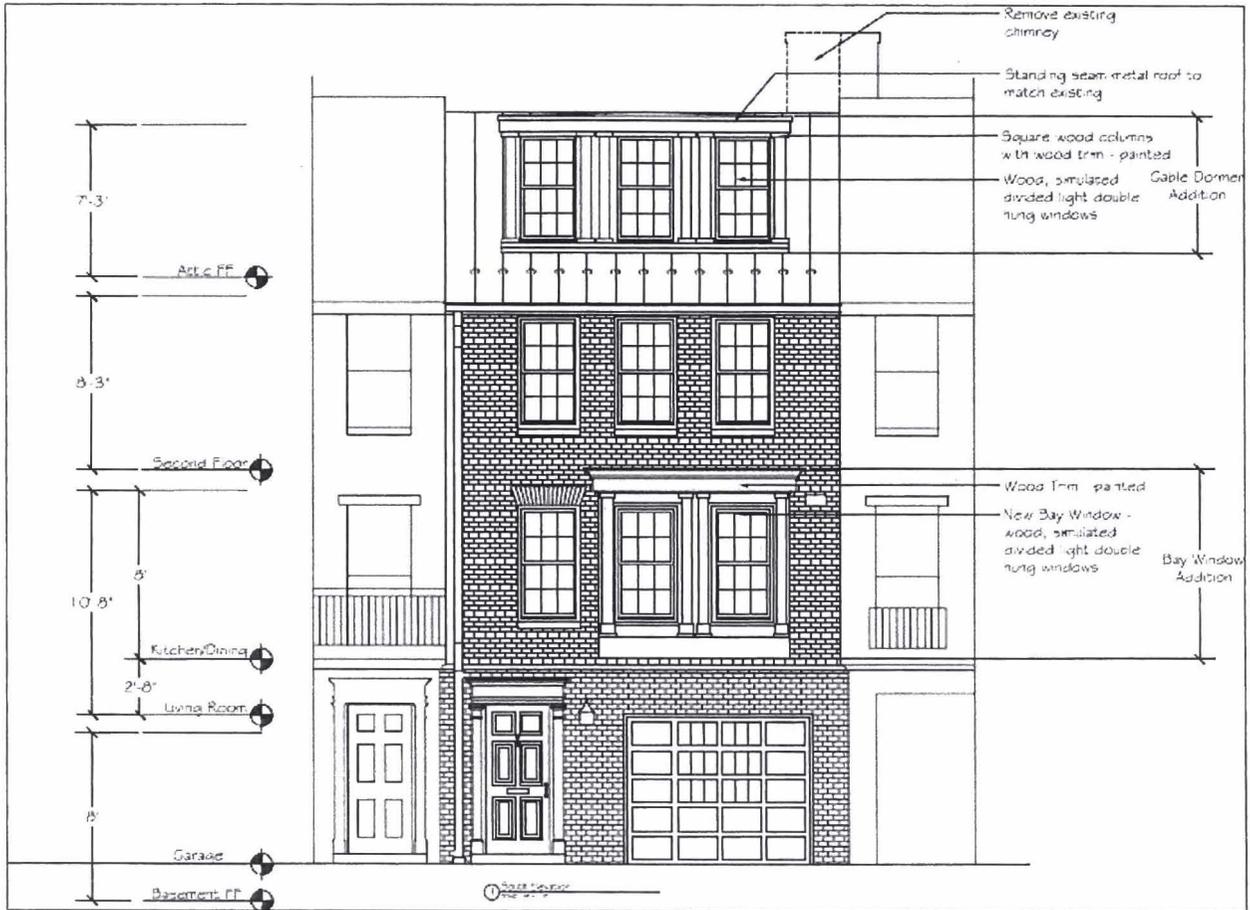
Proposed front (south) elevation with projecting bay window and dormer.
